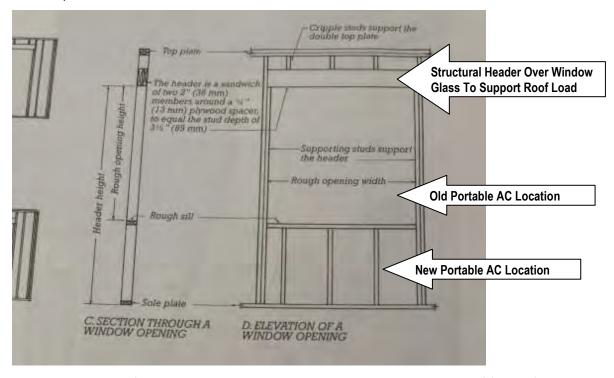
Window Construction With Header In Wall And Relative Location Of Both Old And New Locations Of Portable Window AC Unit Underneath Window At West Wall (White Arrows)
